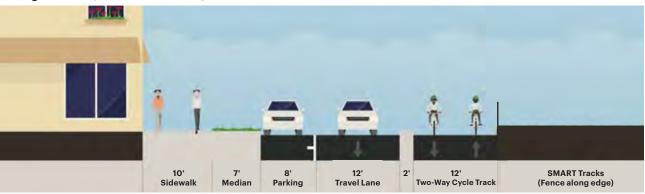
(Above) Key map of street section location Figure 6.38 (Right) Street sections illustrating existing conditions, near-term changes, and long-term transformation of this street segment
